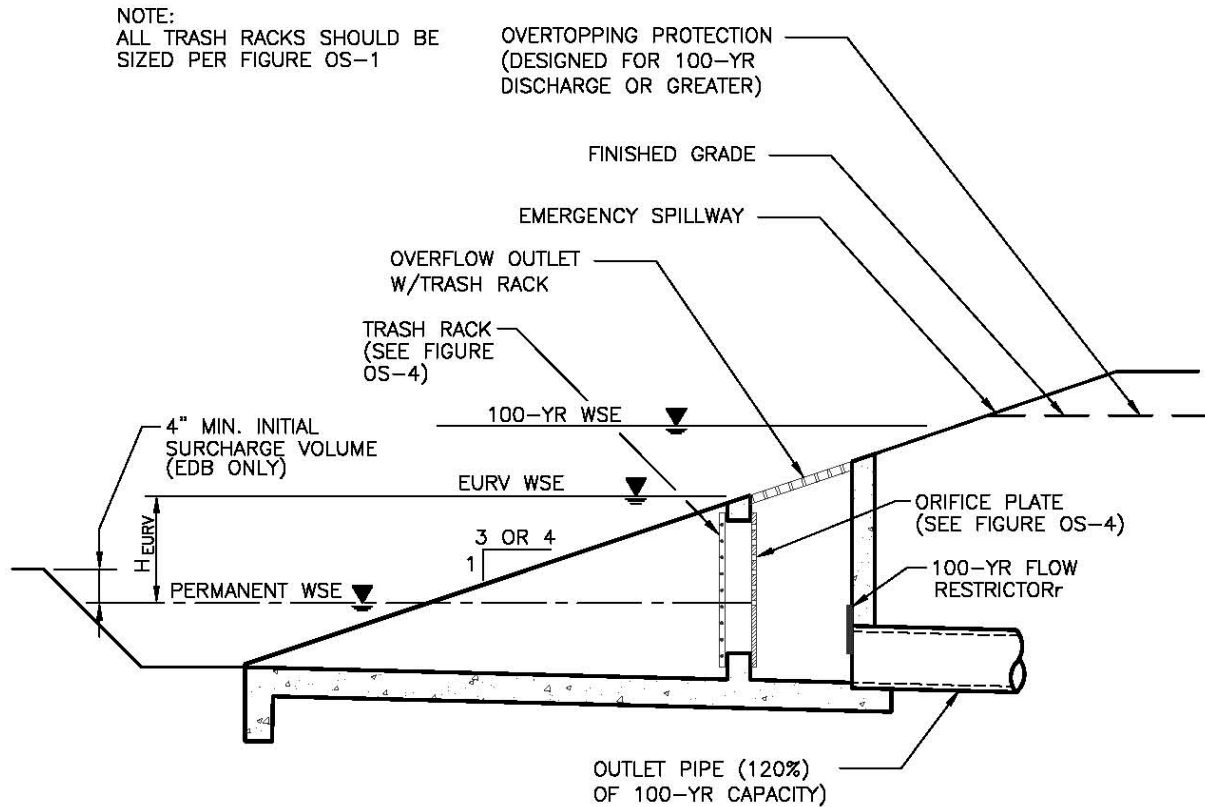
Typical Outlet Structure for Full Spectrum Detention
